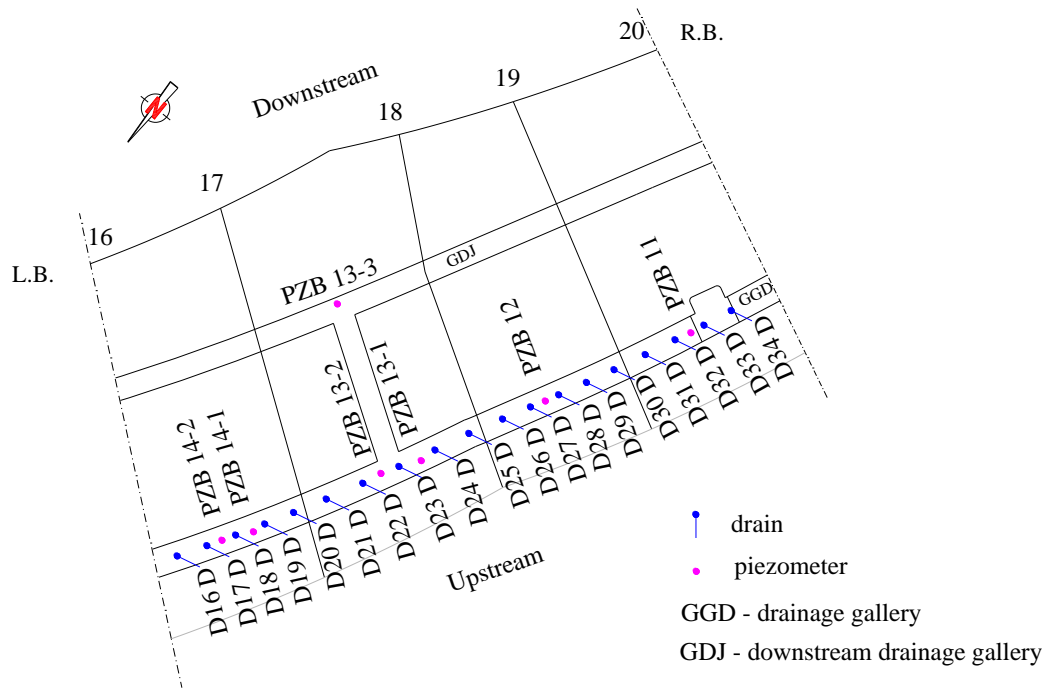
Location of drains and piezometric boreholes in the foundation of blocks 16-17, 17-18 and 18-19.
